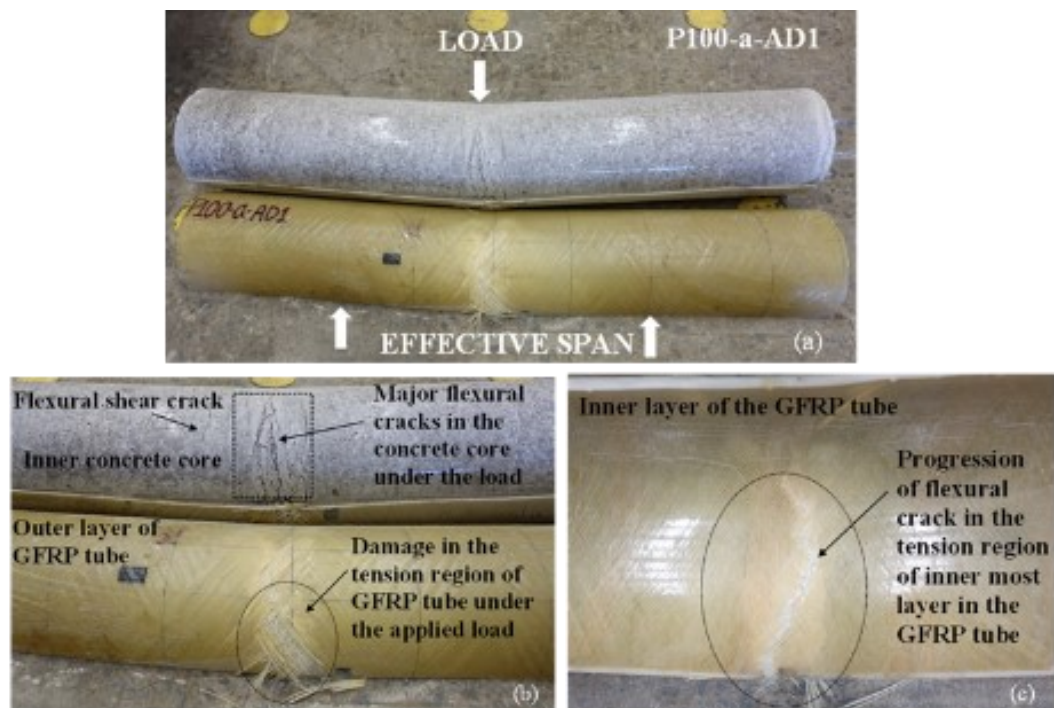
Failure modes in P100-a-AD1 specimen: (a) Longitudinal cross-section of CFFT; (b) Inner concrete core and outer layer of GFRP tube; (c) Inner layer of GFRP tube
